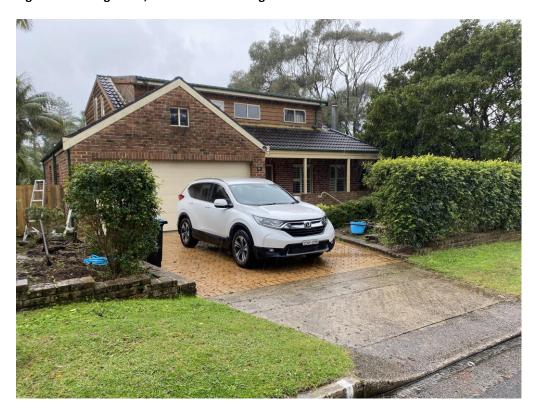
Looking north east, the front of the subject site showing the first floor roof line
